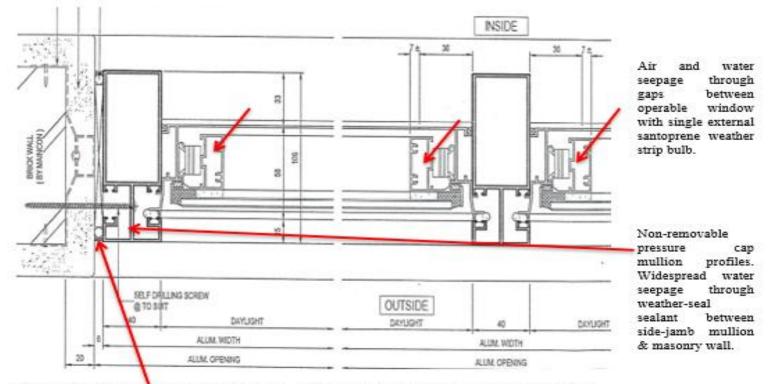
& 1.6: Typical Curtain Wall Glazing – Vertical Mullion and Operable Window profiles (Note: Operable window does not match as-built condition)
